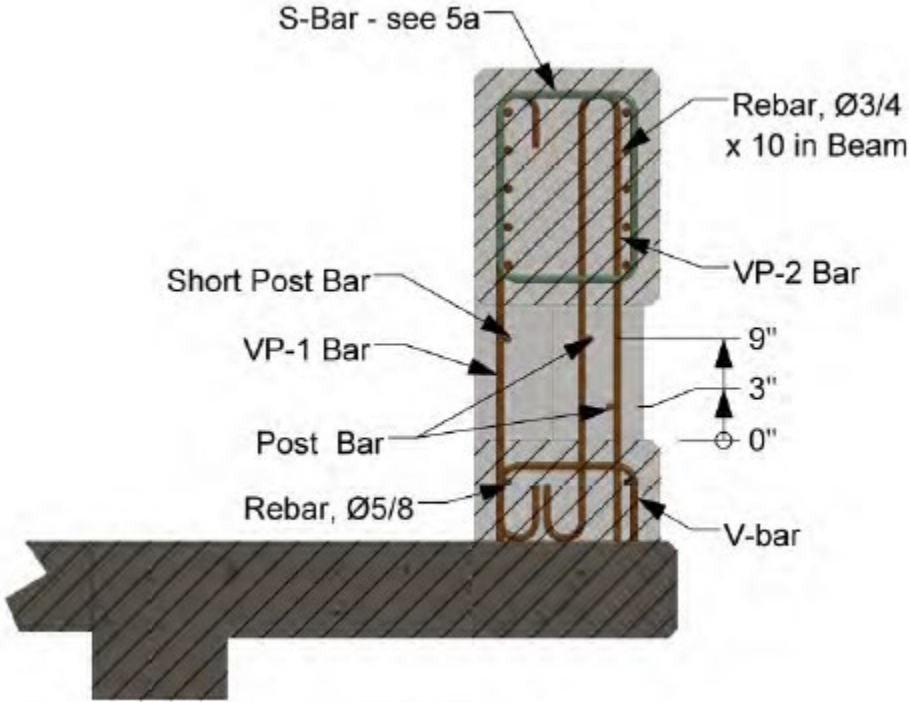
TL-5 TxDOT T224 Bridge Rail Reinforcement [13]
